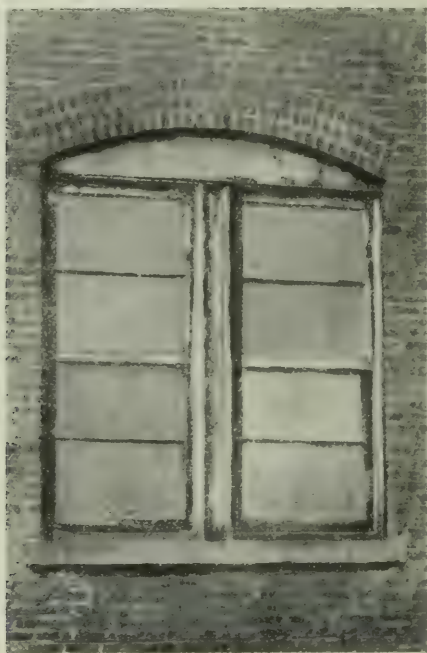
An excellent Type of Fire Barrier from Exterior Fires : Metal Frame with Wire-Glass.
